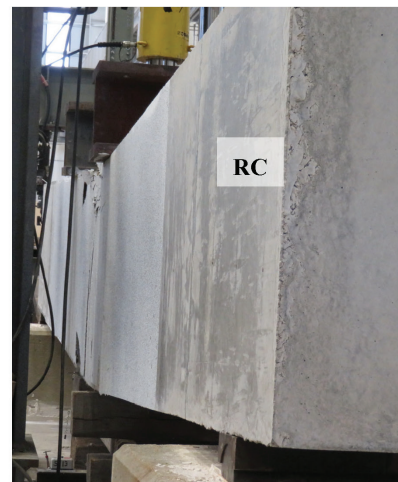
Concrete crack pattern (east side)—specimen OOPM-C.
